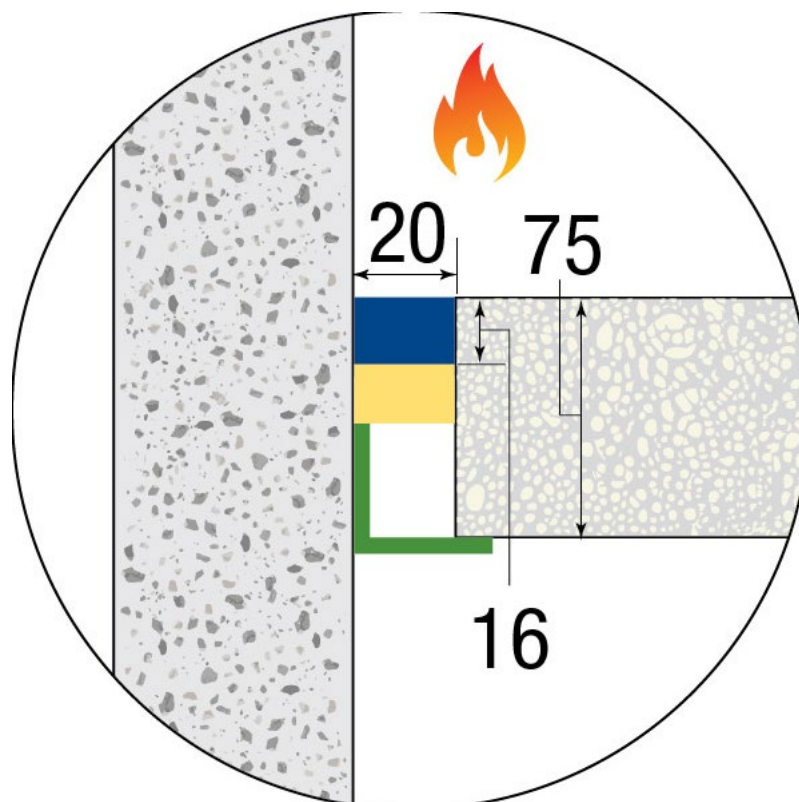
Client Supplied Drawing - Specimen B - Section View
